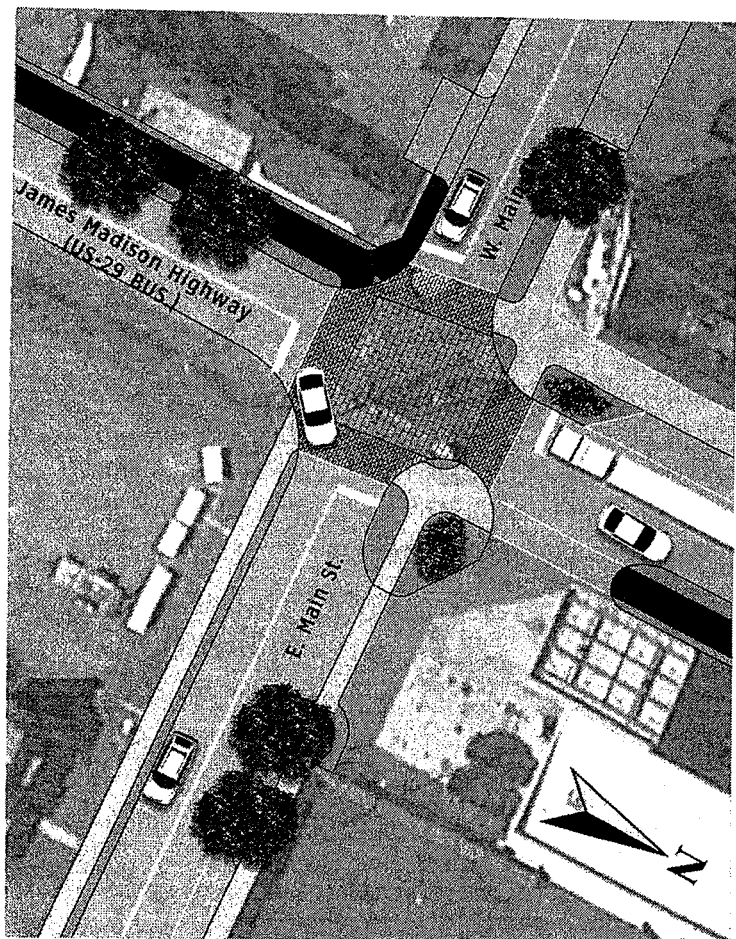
Rendering of Proposed Raised Crosswalk, Shared Use Path, and Curb Extensions at Main Street and Business 15/29⁶
